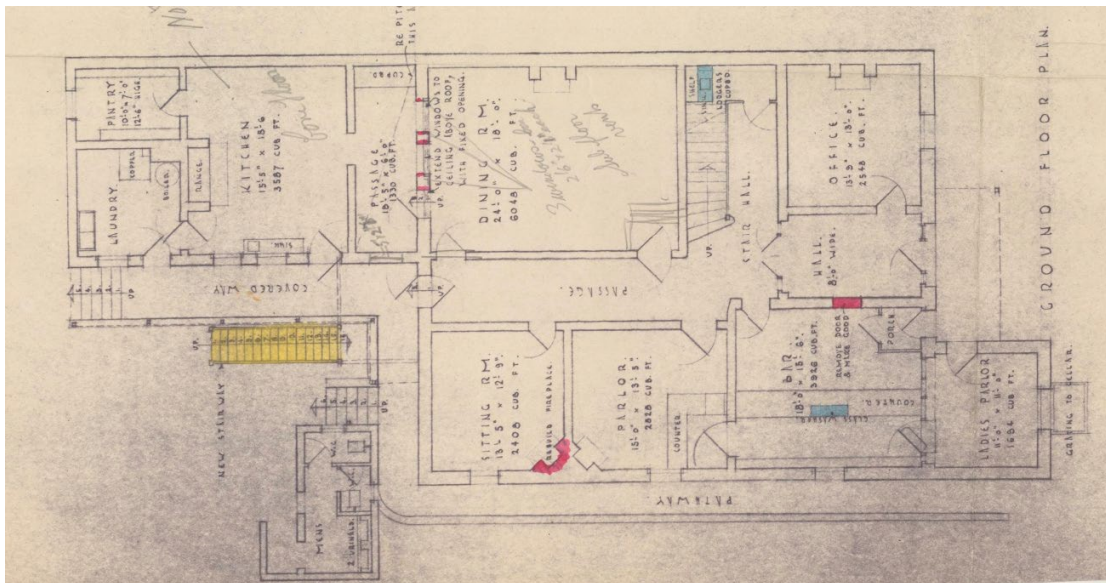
Ground floor plan, showing configuration in 1954 and proposed changes. (BP 3930, 1954)
